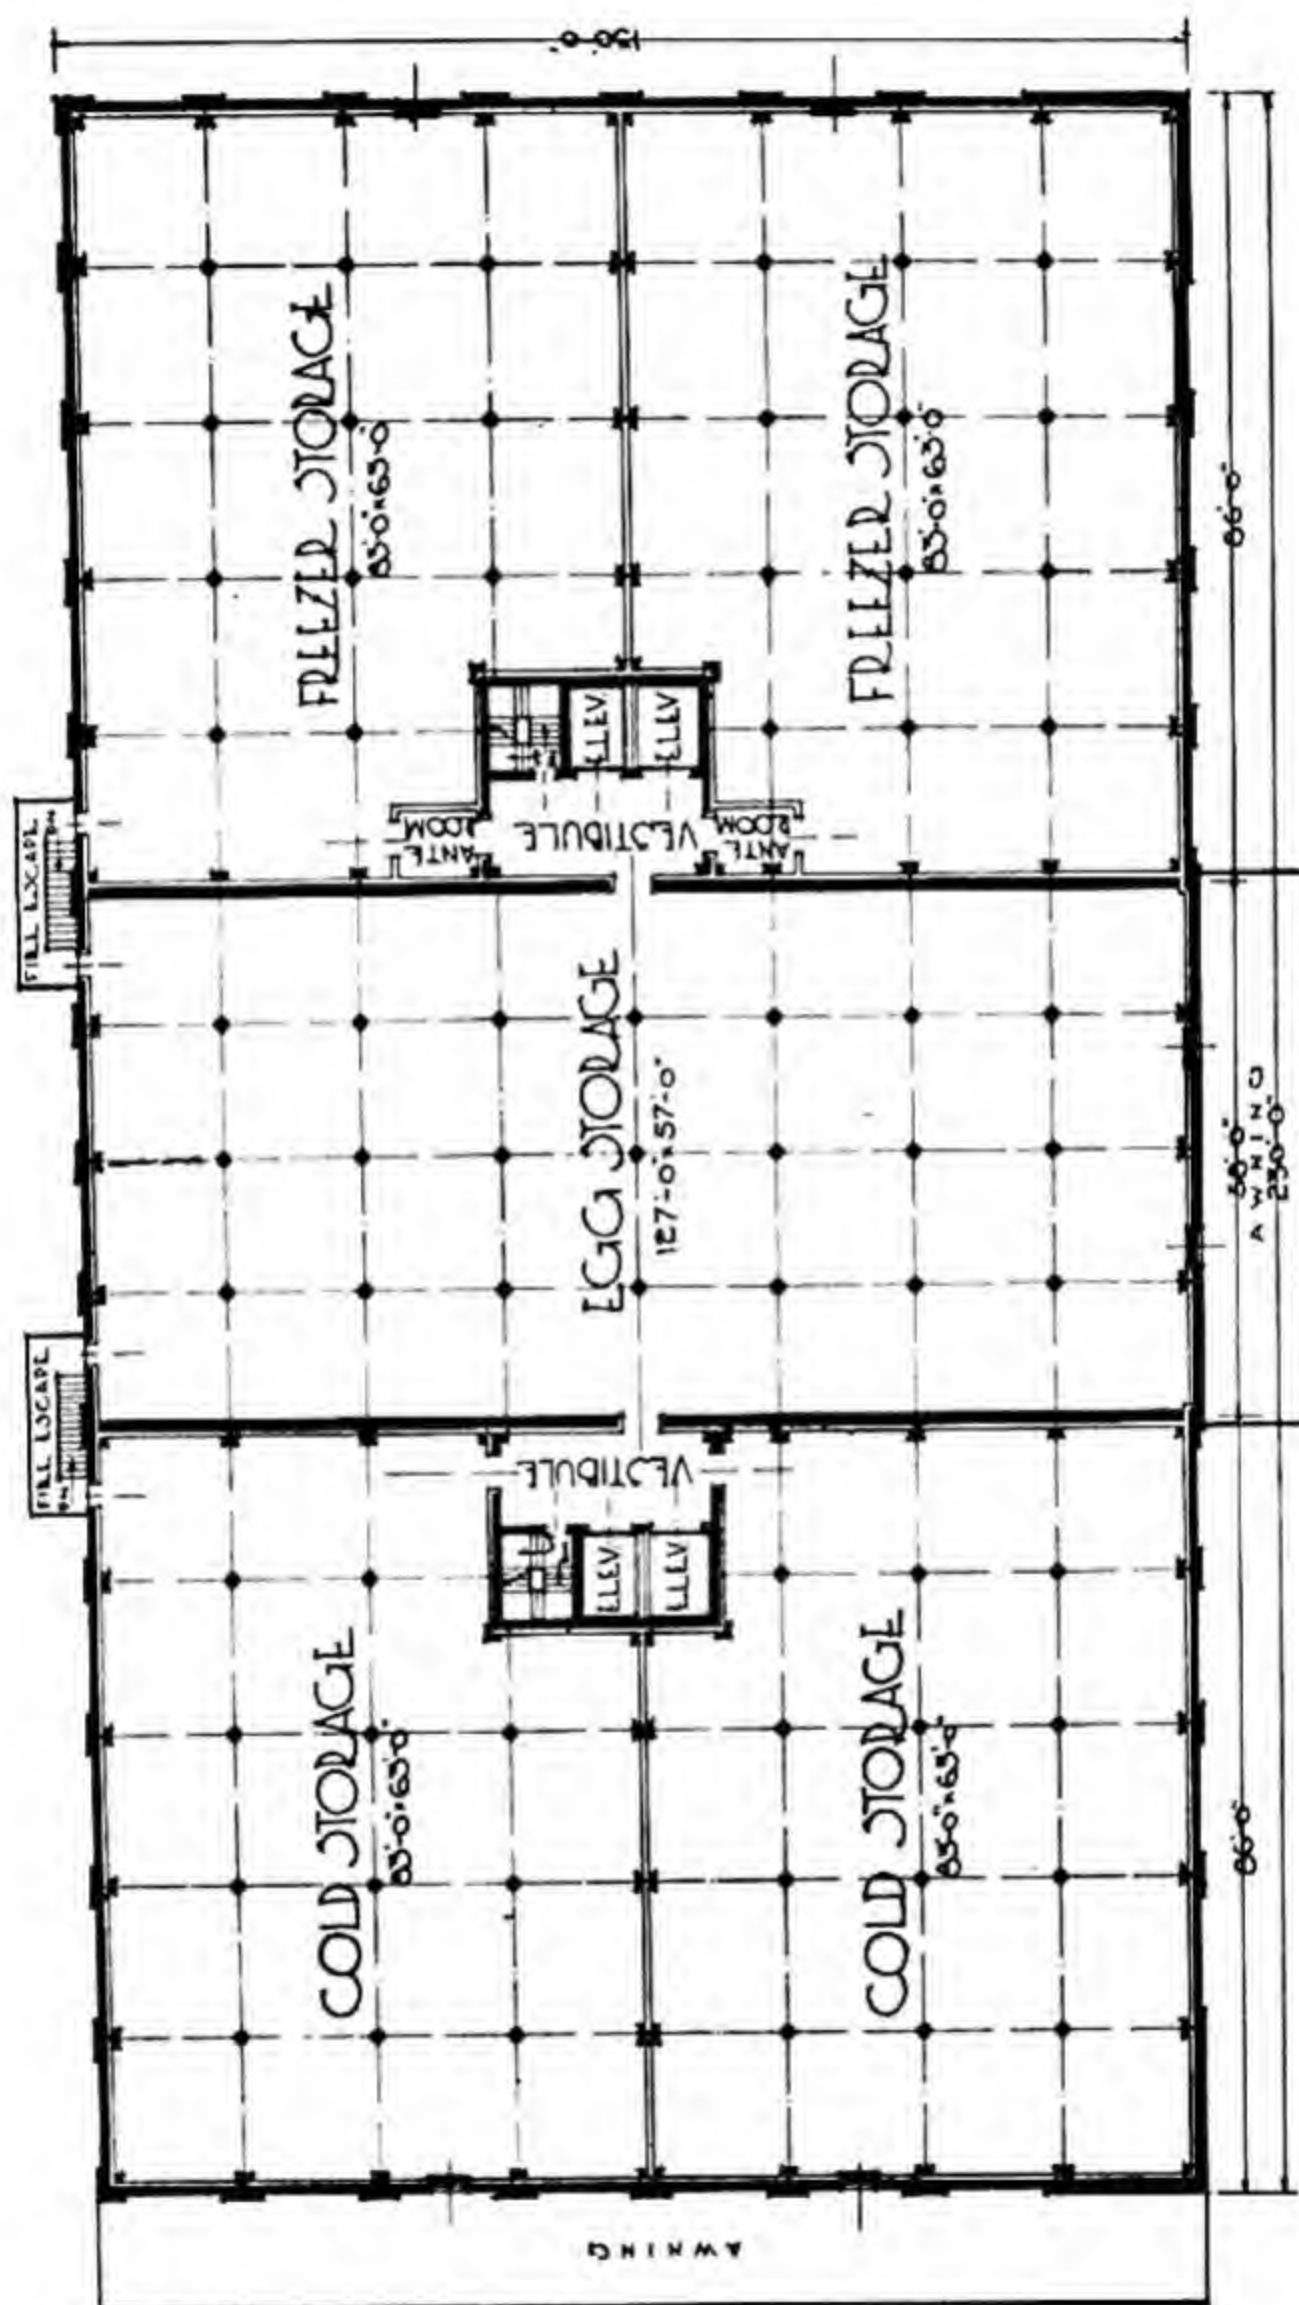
Typical Floor Plan of Merchants' Cold Storage & Warehouse Co. Plant, Chicago, Ill.
